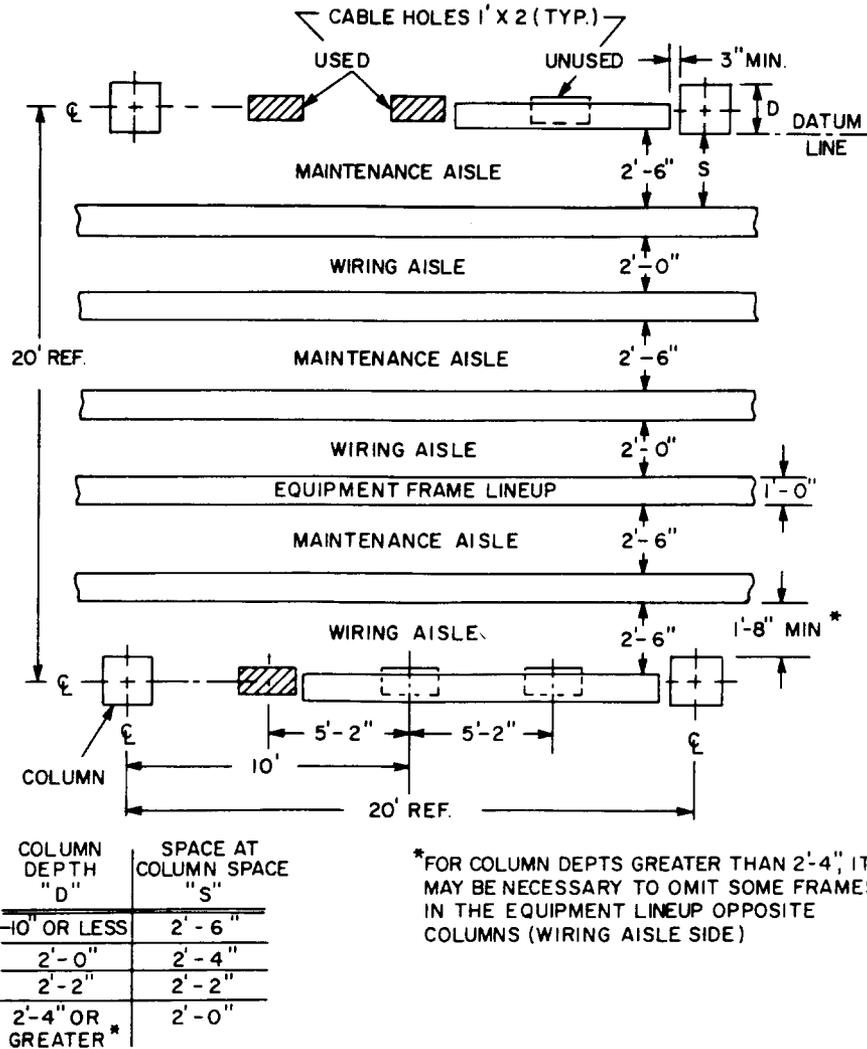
NEBS Standard Floor Plan for Principal Depth 12-Inch Frame
